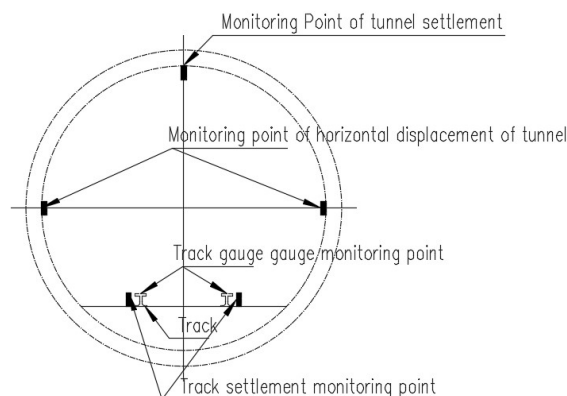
Cross-section diagram of the subway tunnel monitoring point
